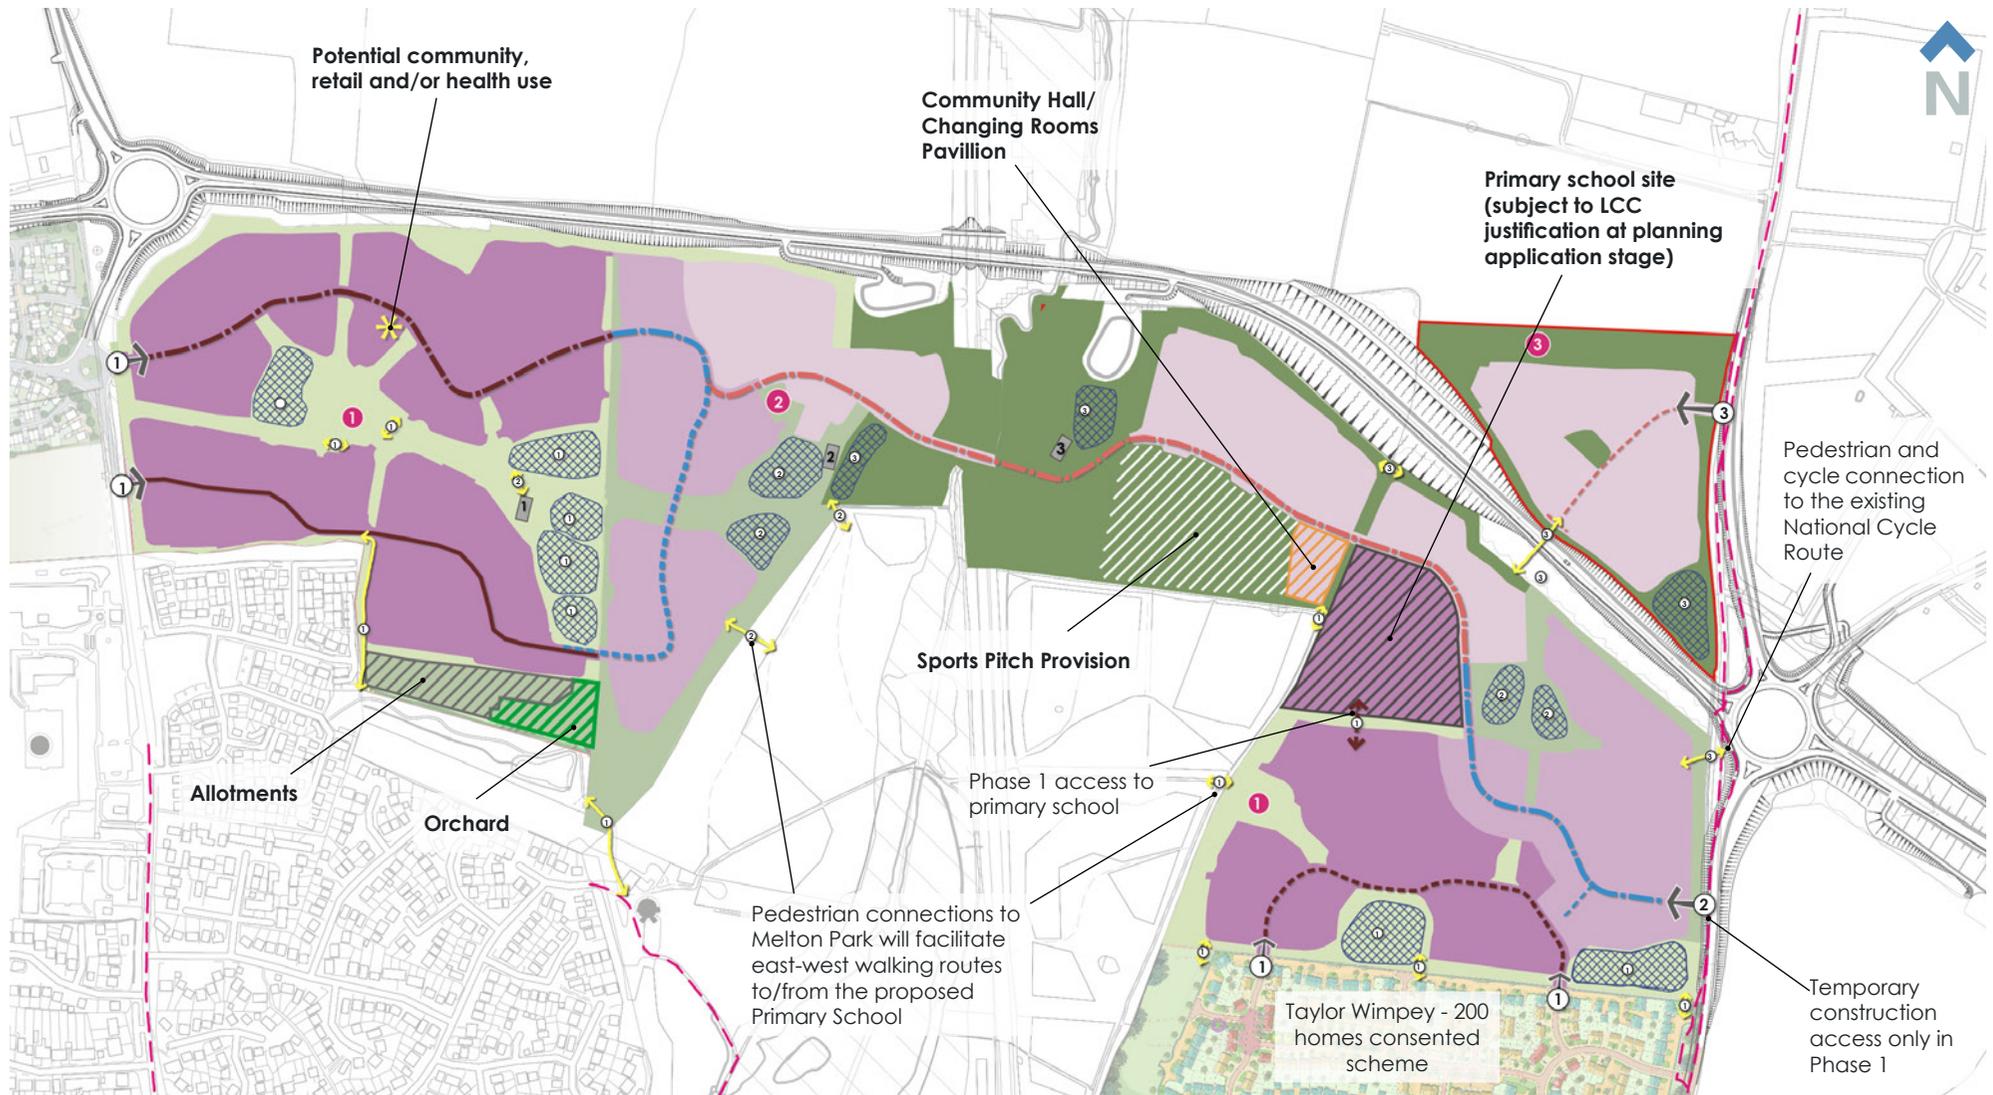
Phasing Plan for the MNSN East of Scalford Road.
